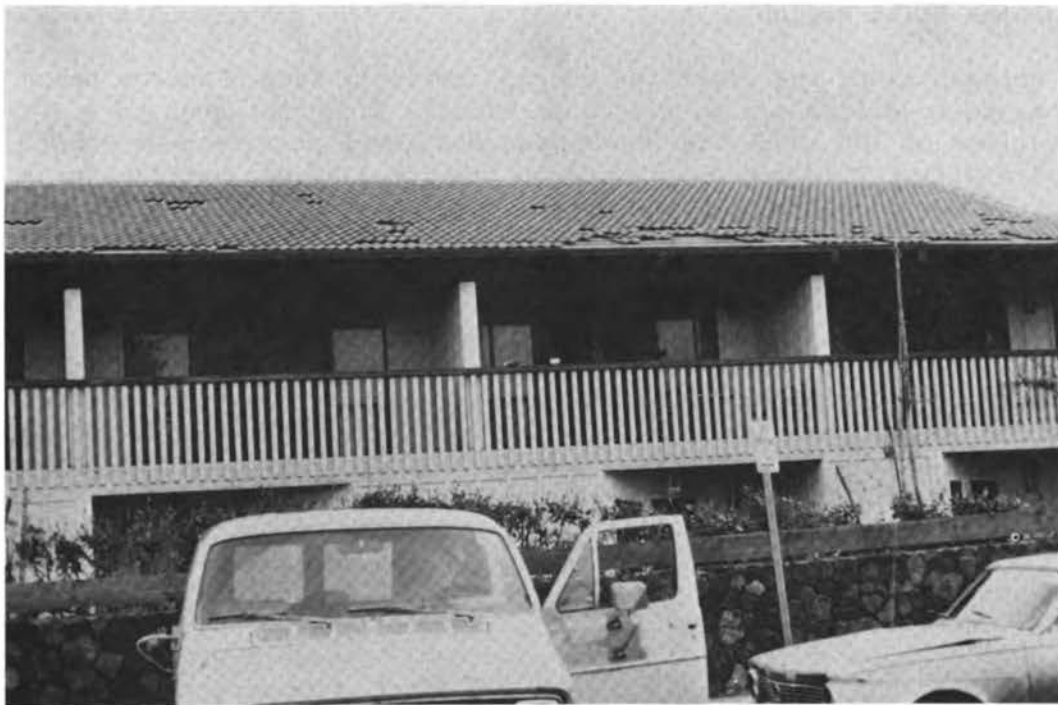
Cladding damage to building inland from Poipu Beach, Kauai.
